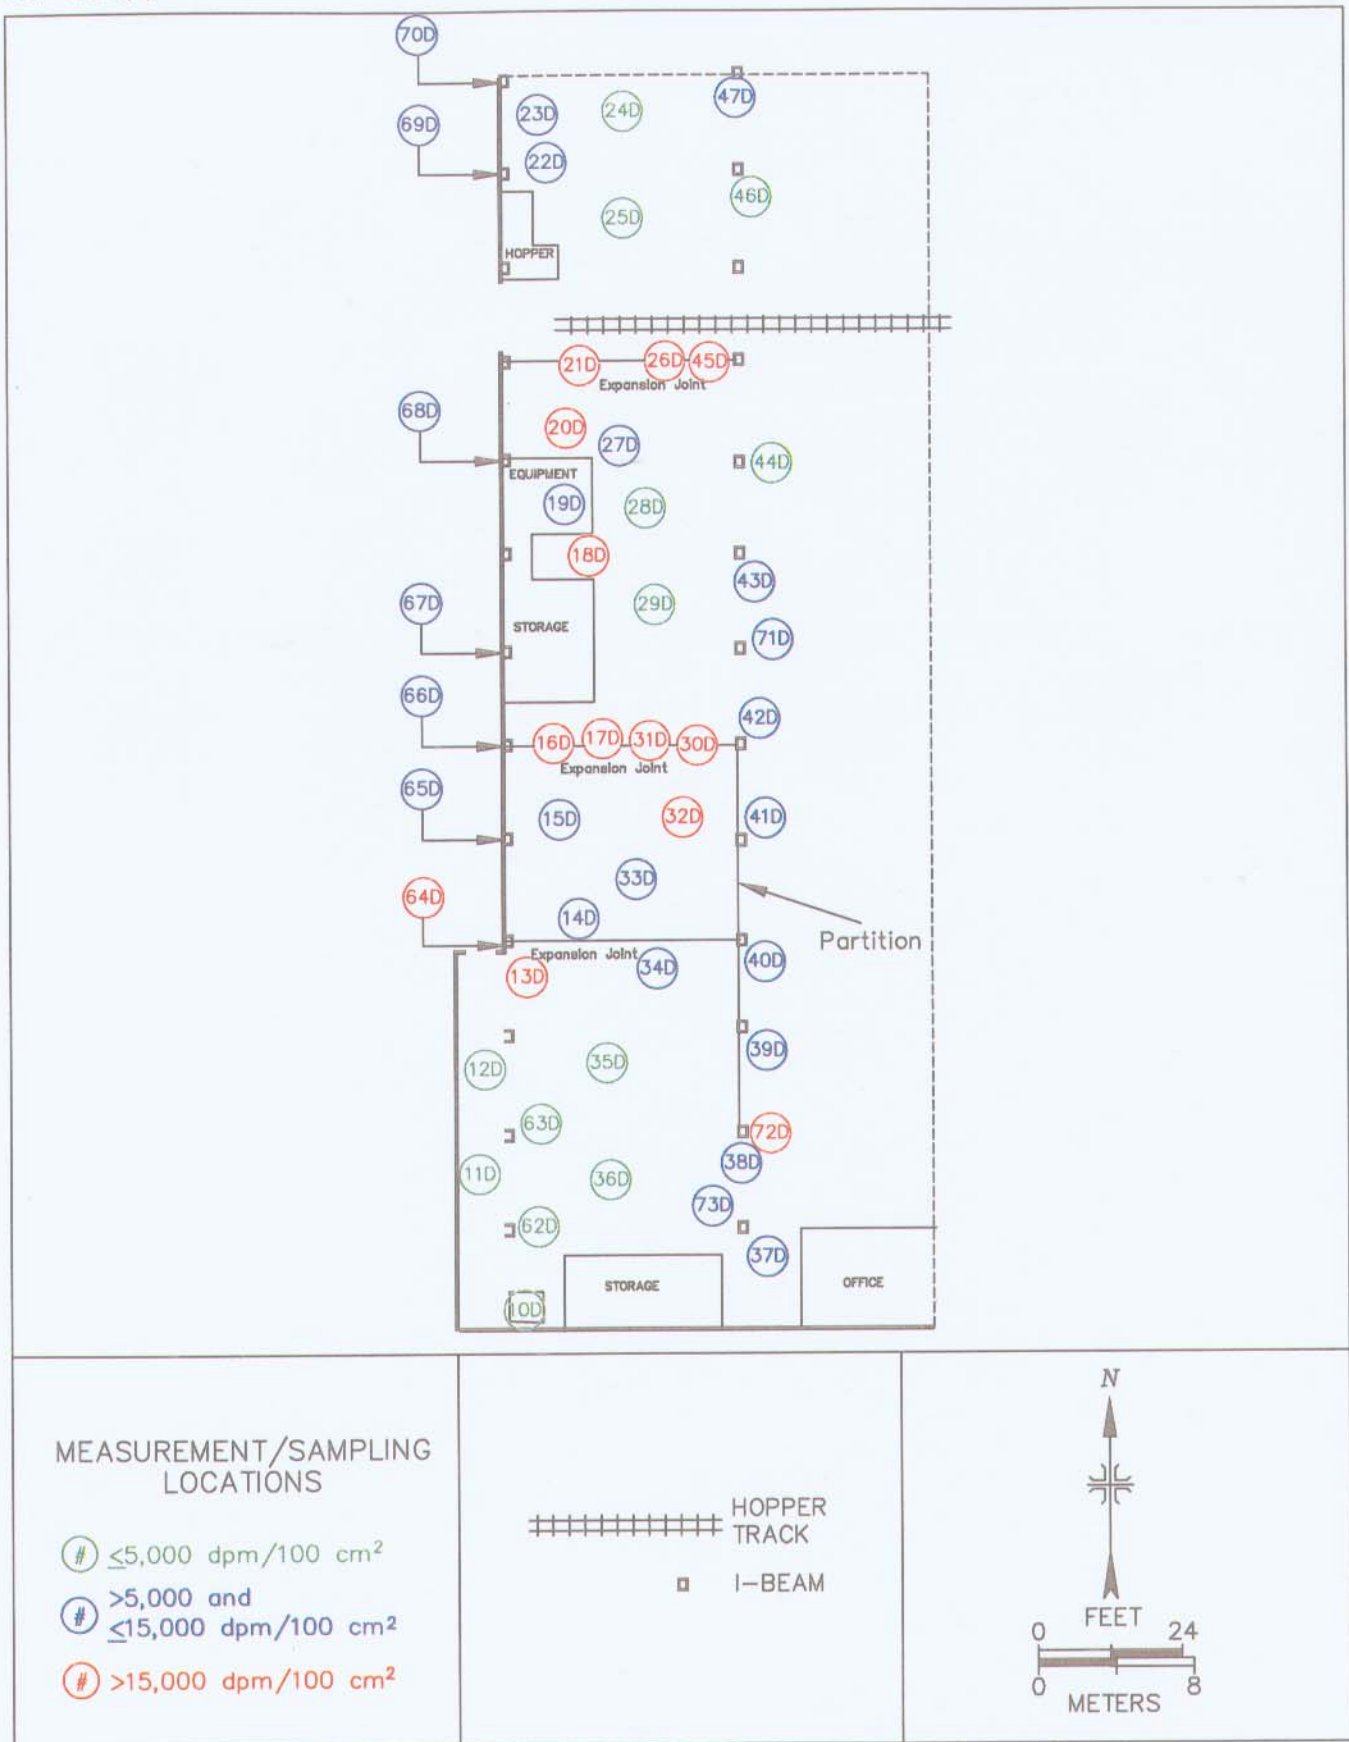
Building 24, Southwest Area, Floors, Lower Walls, and Equipment – Direct Measurement and Sampling Locations
